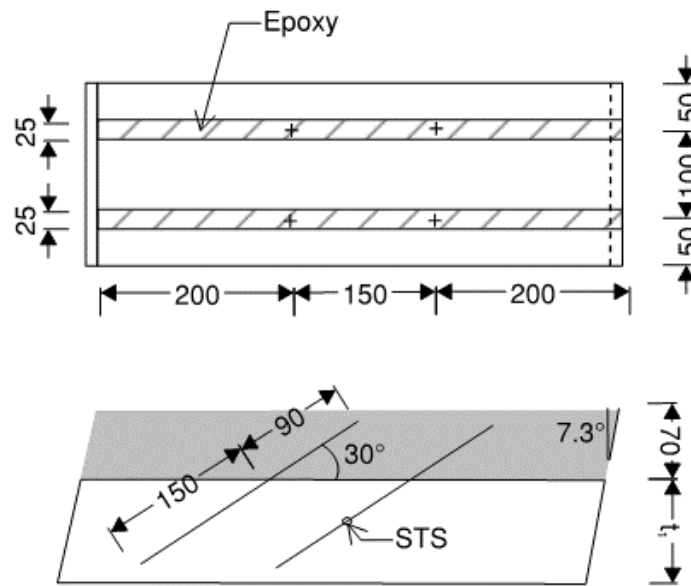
Small-scale shear specimen with epoxy and STS at 30°
